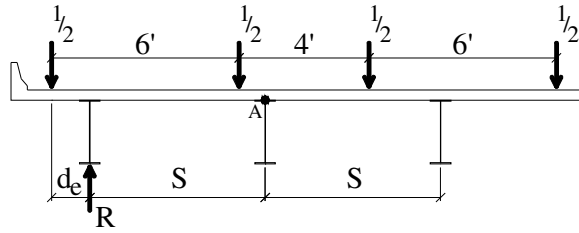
Loading Diagram for Exterior Girder with Two Lanes Loaded and Two Wheels to Beam
